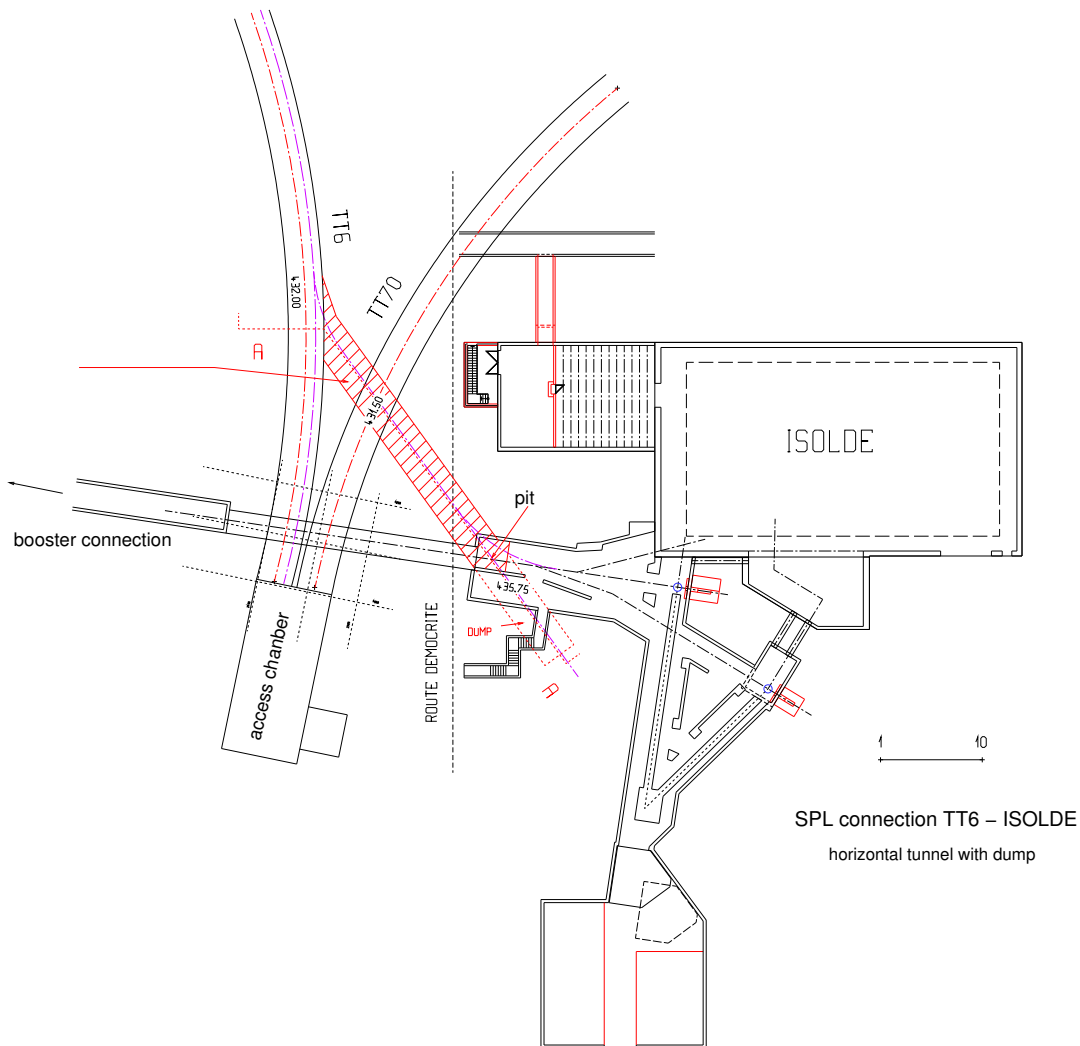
Connection of the transfer tunnel to ISOLDE, plan view
